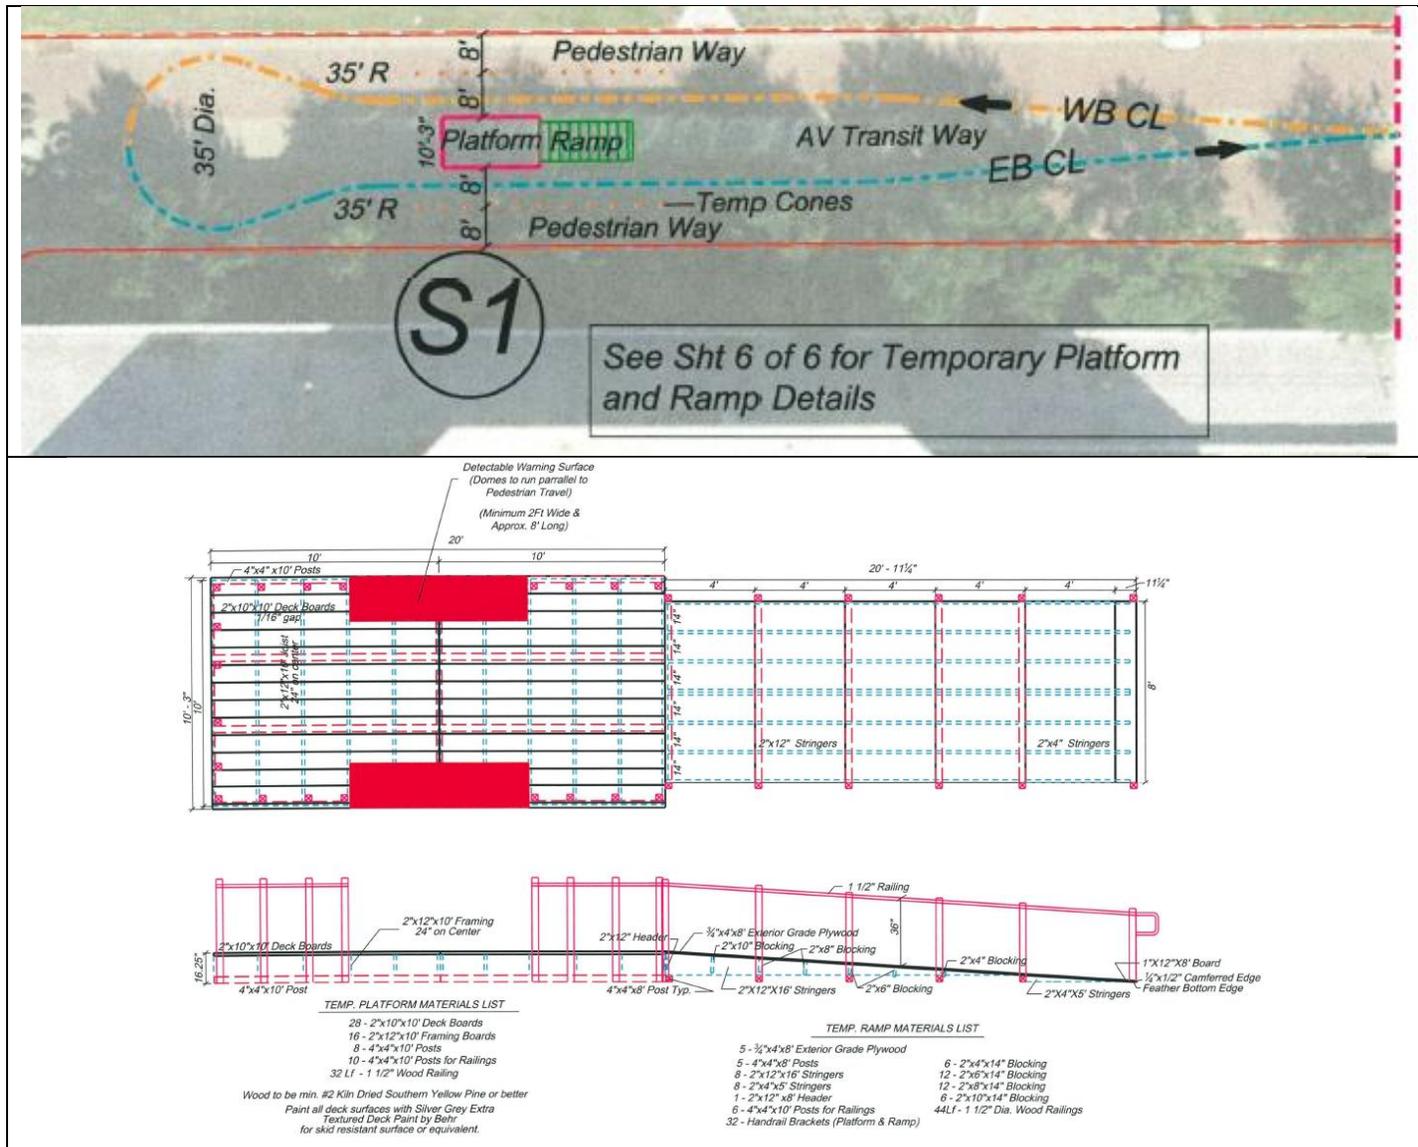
Design Concept for Raised Center Platform Station Concept at West End of Tiger Walk
